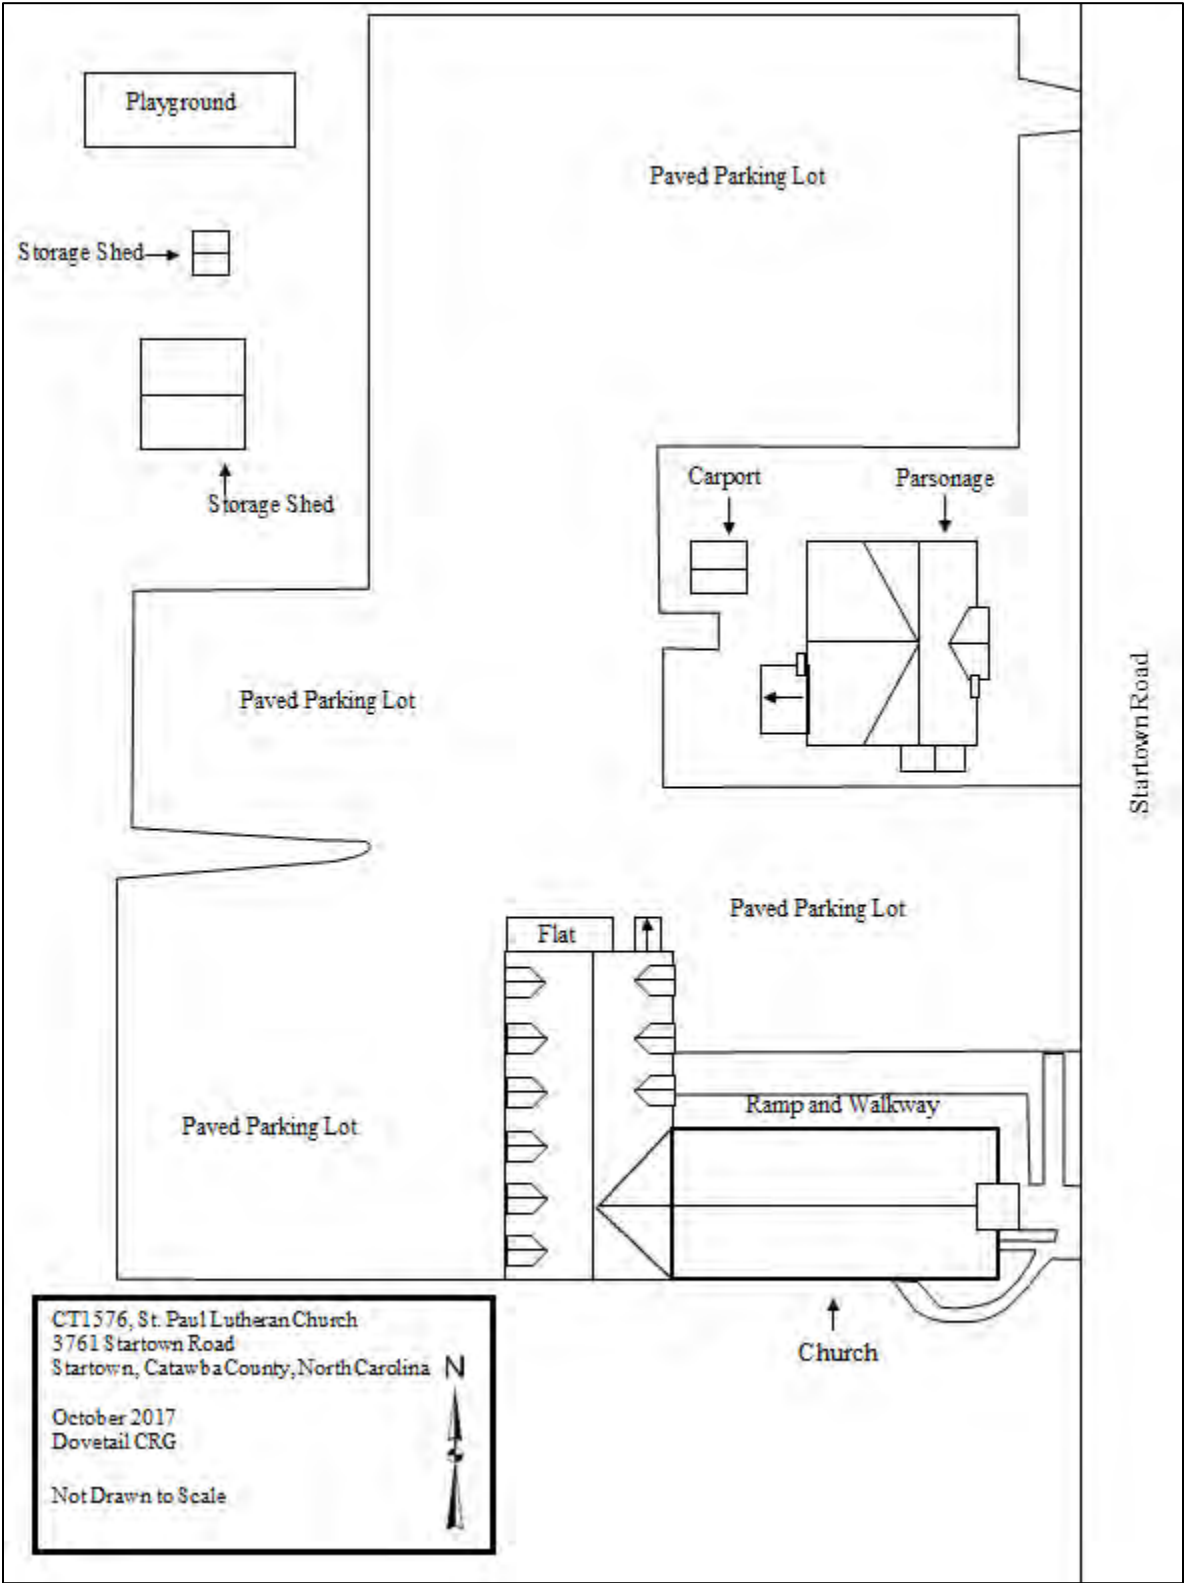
Site Plan for St. Paul Lutheran Church (CT1576).
